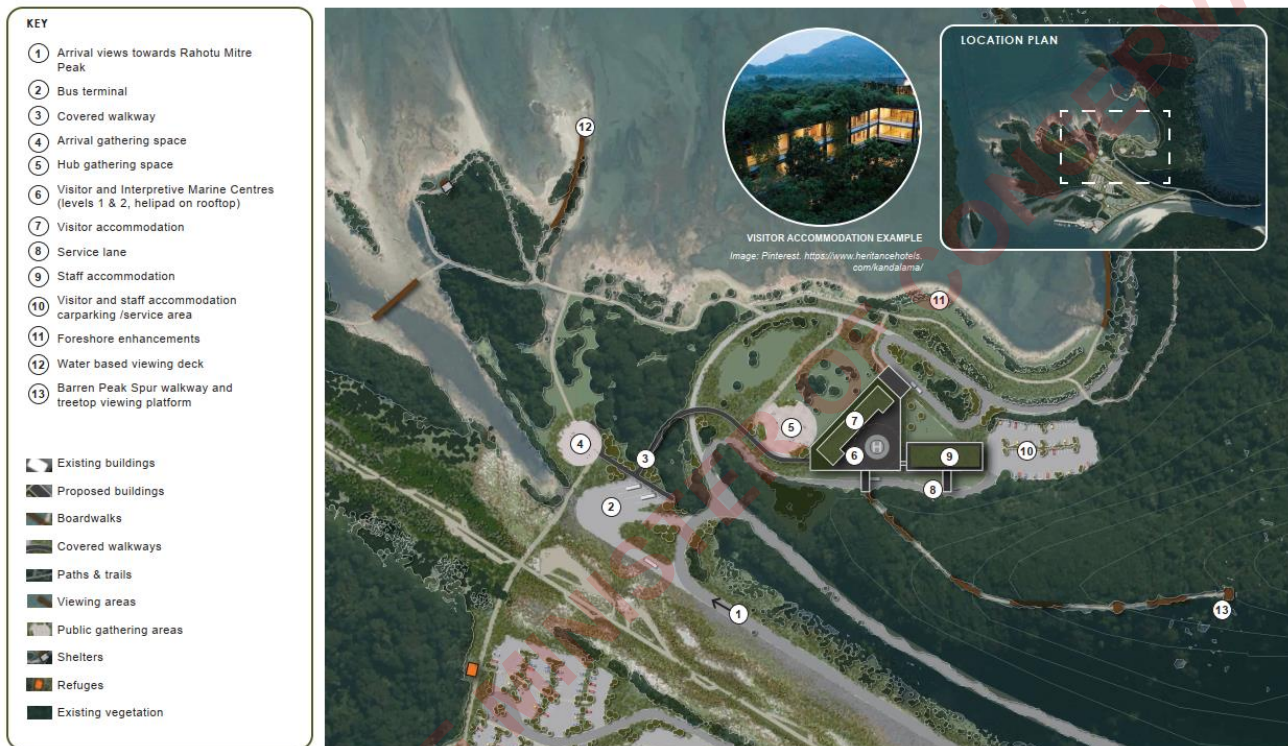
Proposed development plan for visitor's hub as per the MOP Masterplan.
